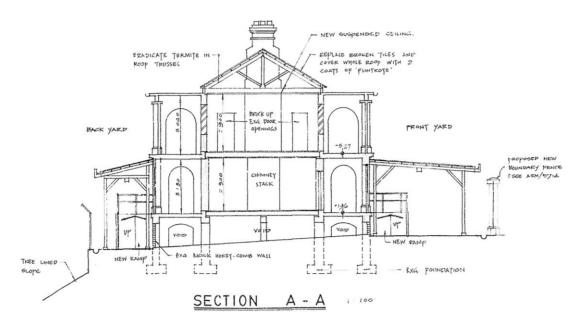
1986 Proposed Section, extracted from Architectural Proposed Plan for Kowloon park 1986, Drawing No. ASM/5701. (Source: Architectural Services Department)
